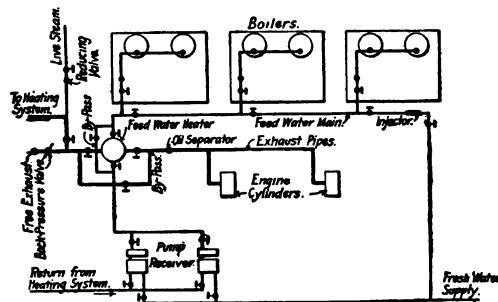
Exhaust and Feed Piping for Noncondensing Plant.
